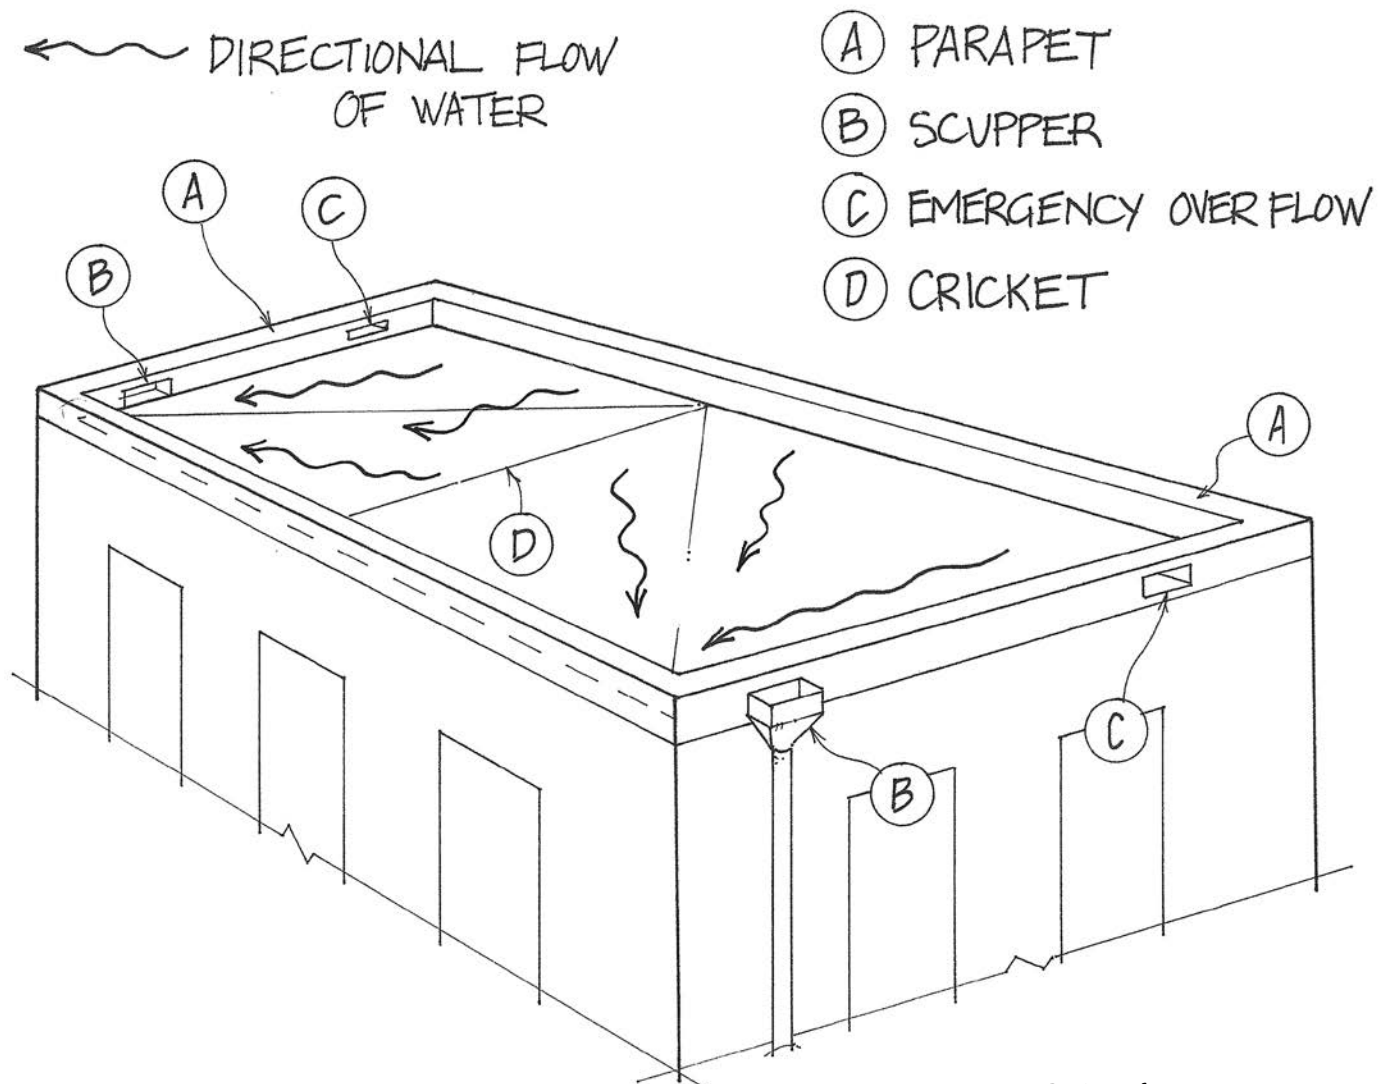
Basic roof components on a typical flat roof with parapets.
